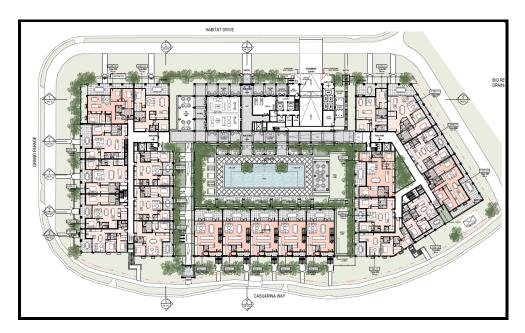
The Proposed Development (Source: Conrad Gargett, Plan DA101, August 2023)
